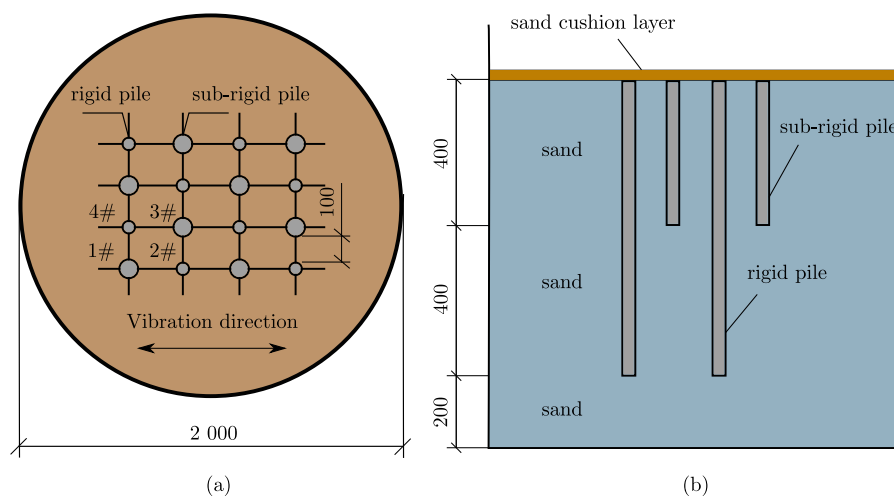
Layout of test model: (a) plan view and (b) sectional view, in mm (Lin *et al.*, 2022)
